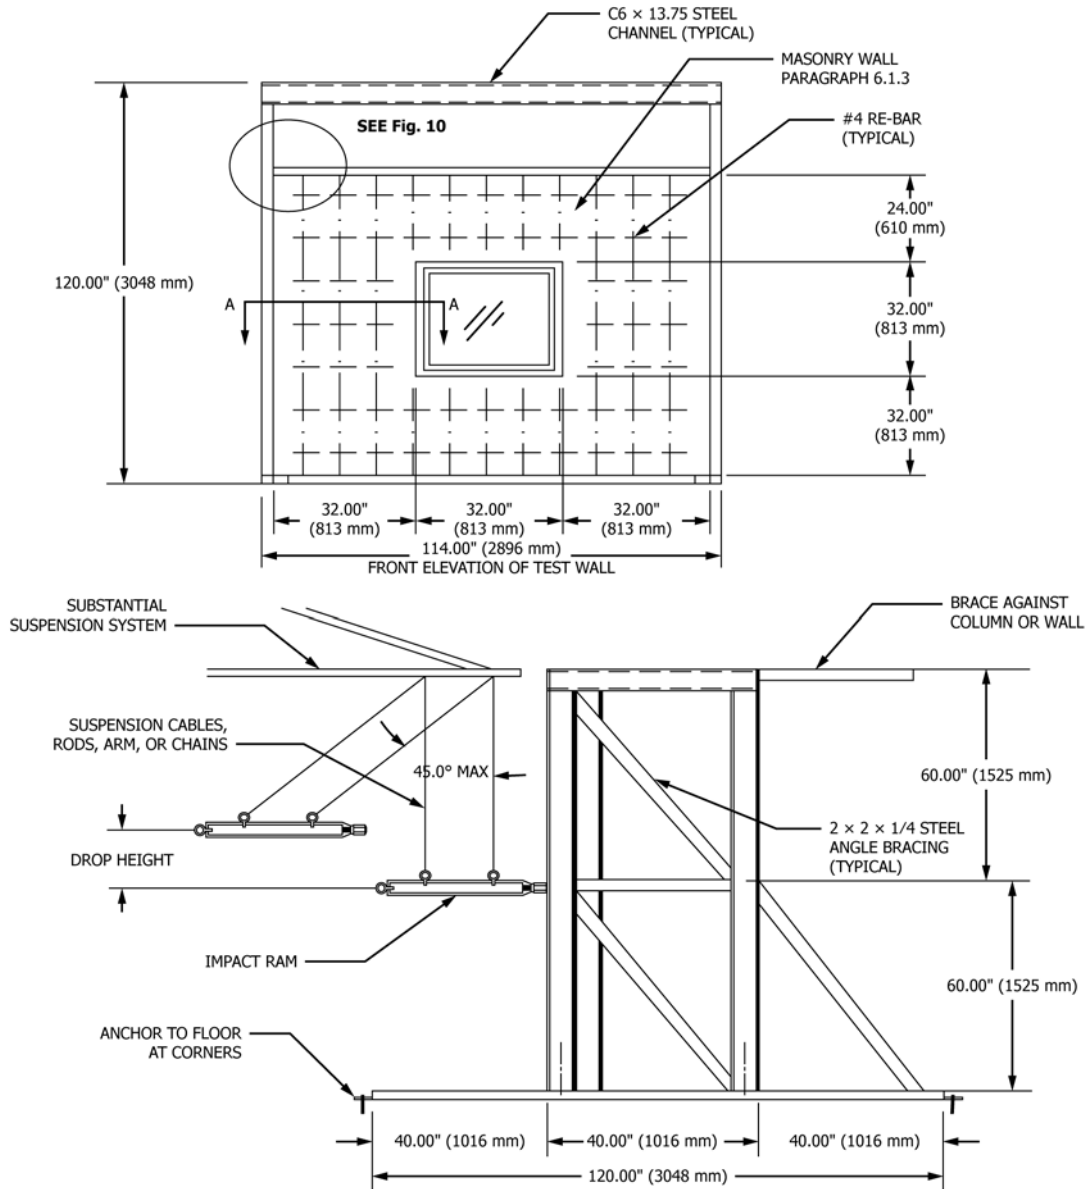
(Four Sided Frame) Test Wall Detention Hollow Metal Anchor Systems (Single Borrowed Light)
